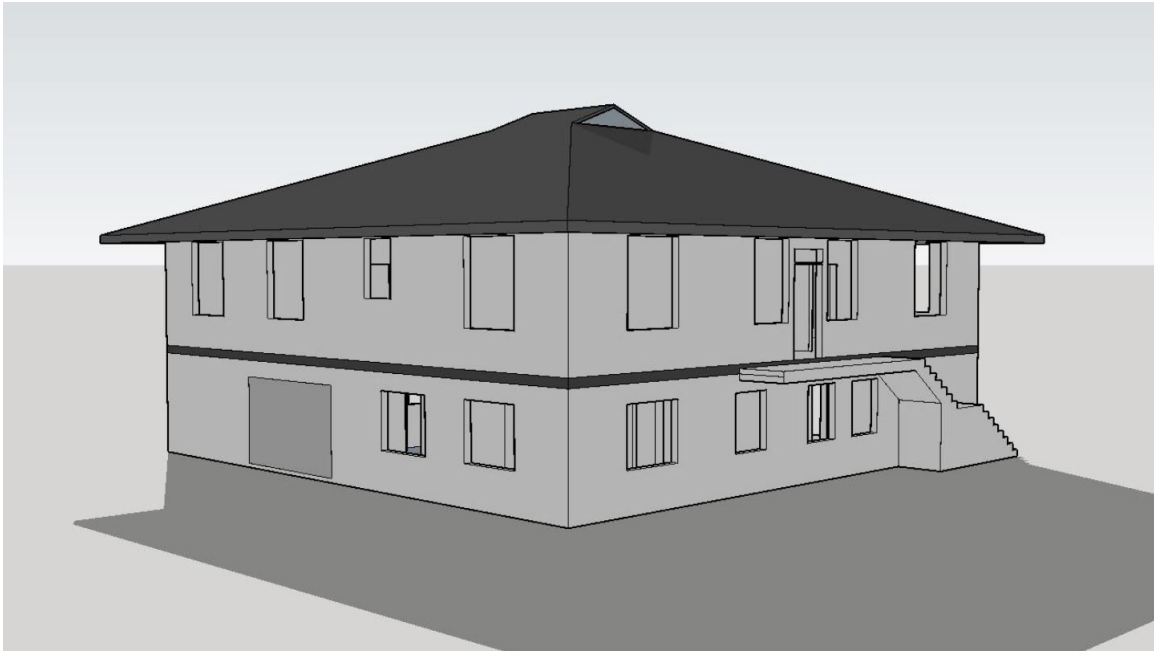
Panama House Type 1, Perspective Looking Northeast. Screenshot in SketchUp by author.
